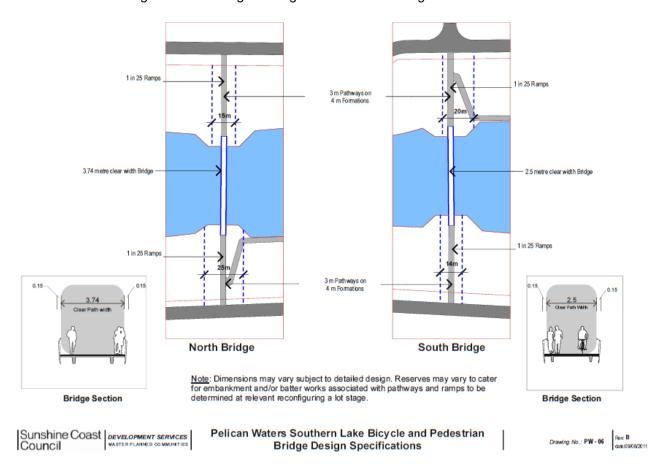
Existing Drawing 6 of Infrastructure Agreement
